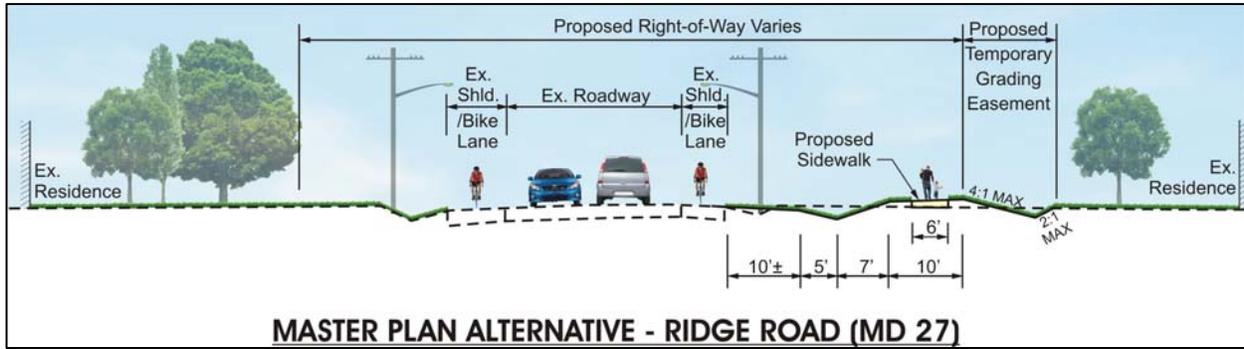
Alternative 2 – Typical Section, along Ridge Road (MD 27)
